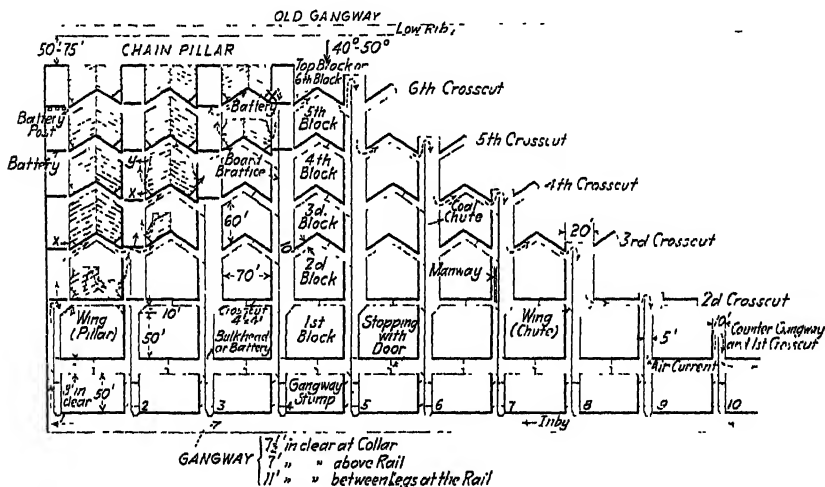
DETAILS OF DEVELOPMENT, PILLAR DRAWING, AND VENTILATION, NEW CASTLE MINE.
